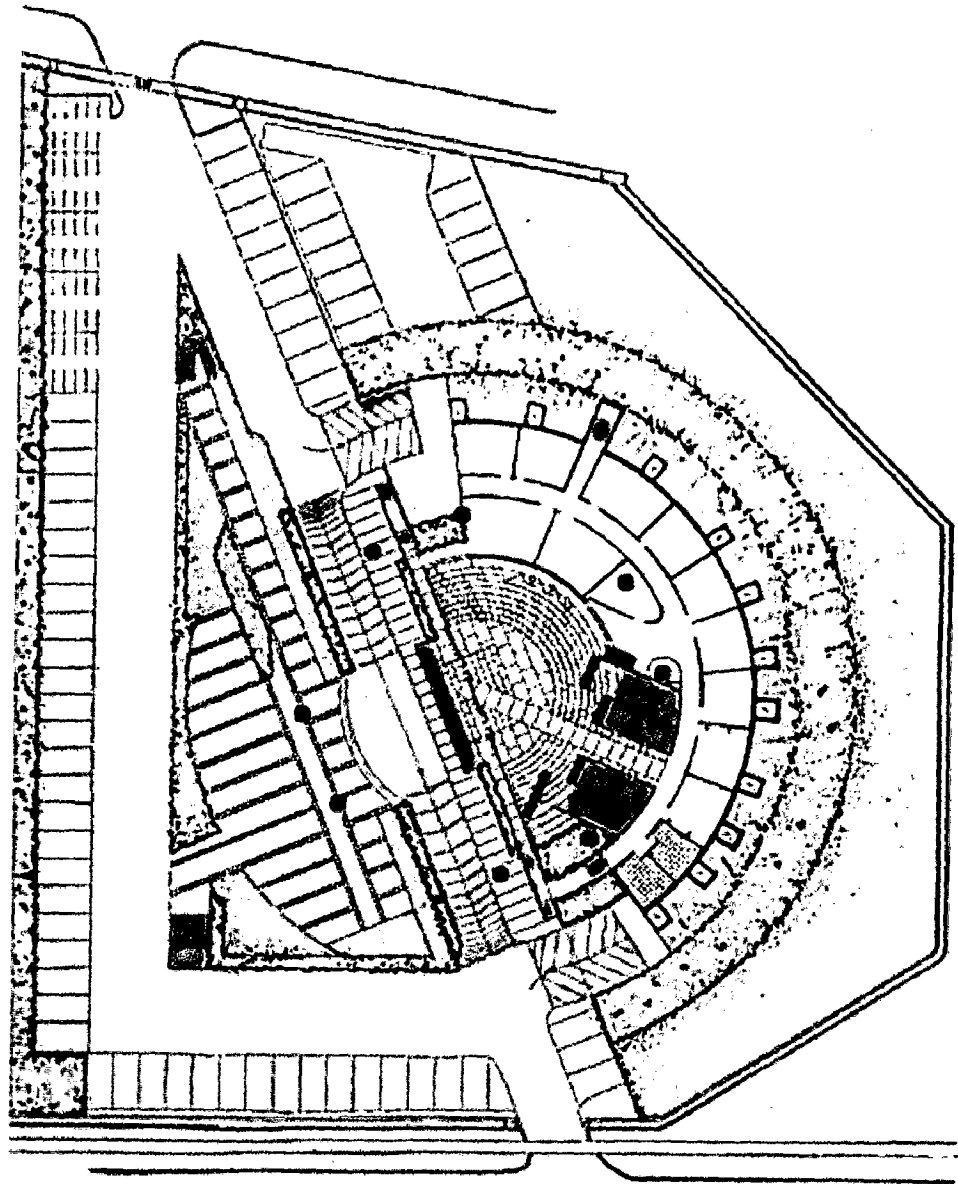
Site Plan (Source: Walkzack, E.L., 2004, Architecture 489)
